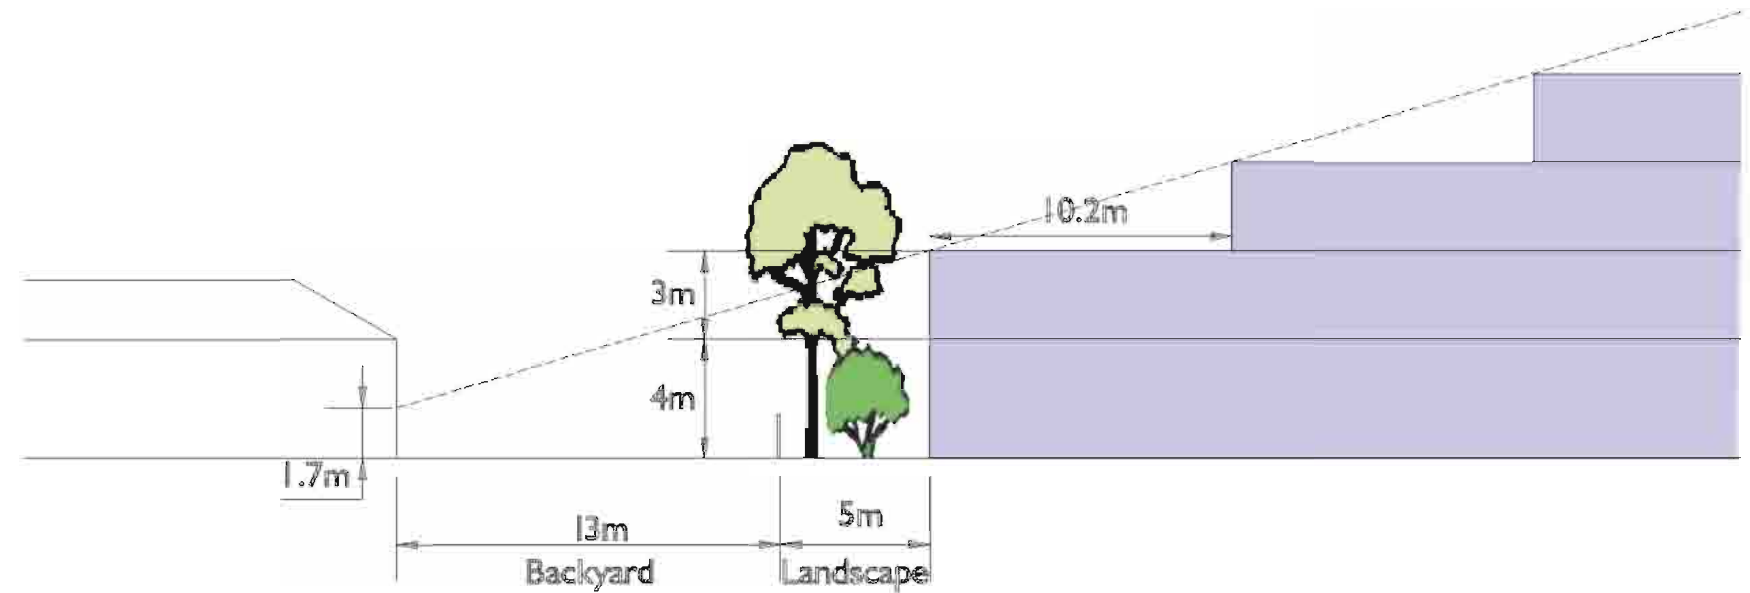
Setback to low scale residential interface adjacent to end-on residential lot fronting Manningtree Road and Lynch Street with landscape buffer
